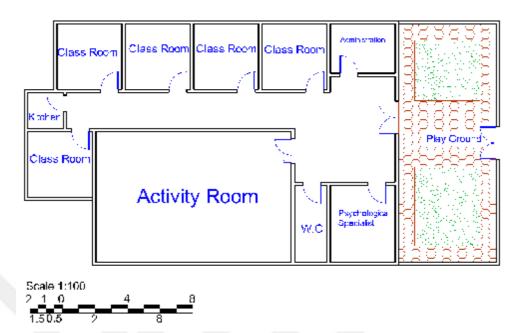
Floor plan of Tripoli A Kindergarten (Drawn by author).
